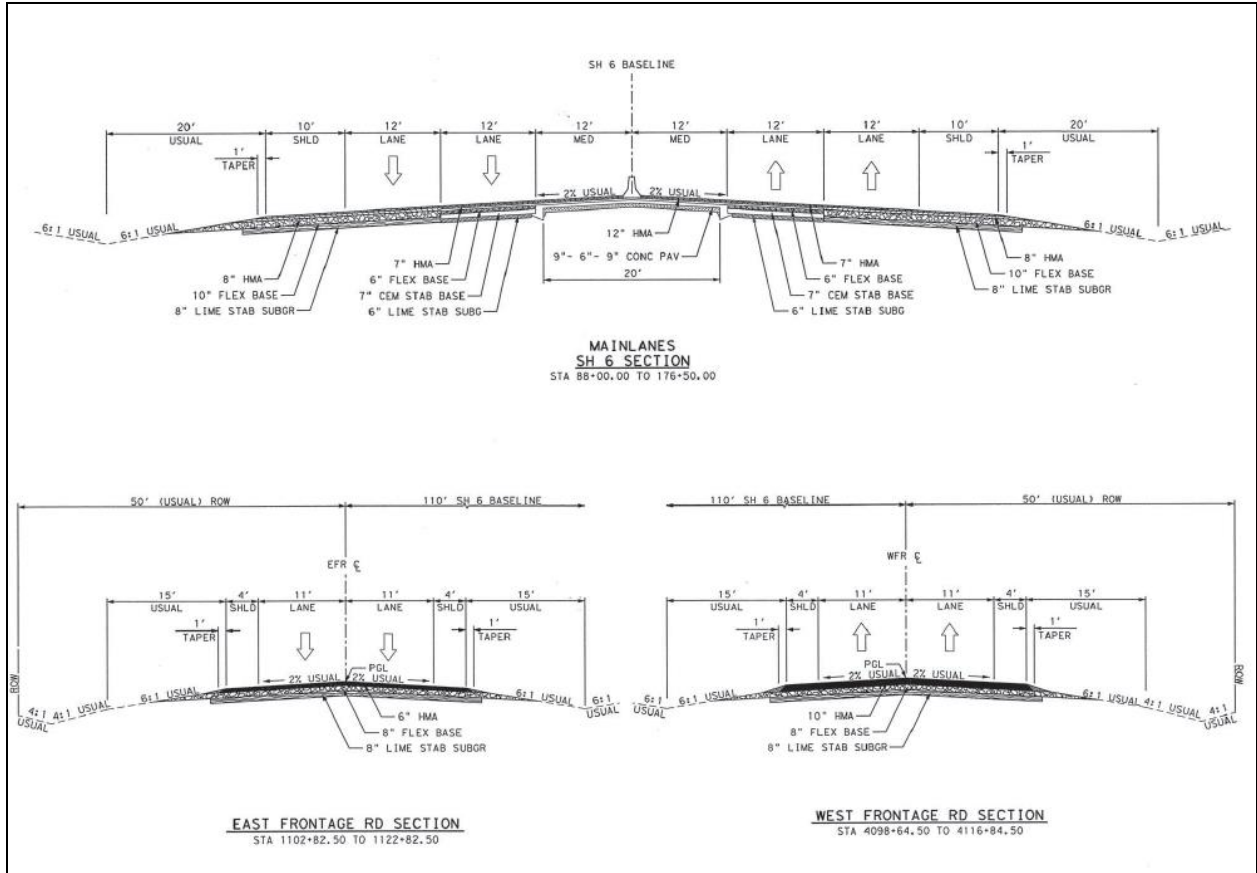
SH 6 Typical Sections from Approximately BS6-R to SH 40.
